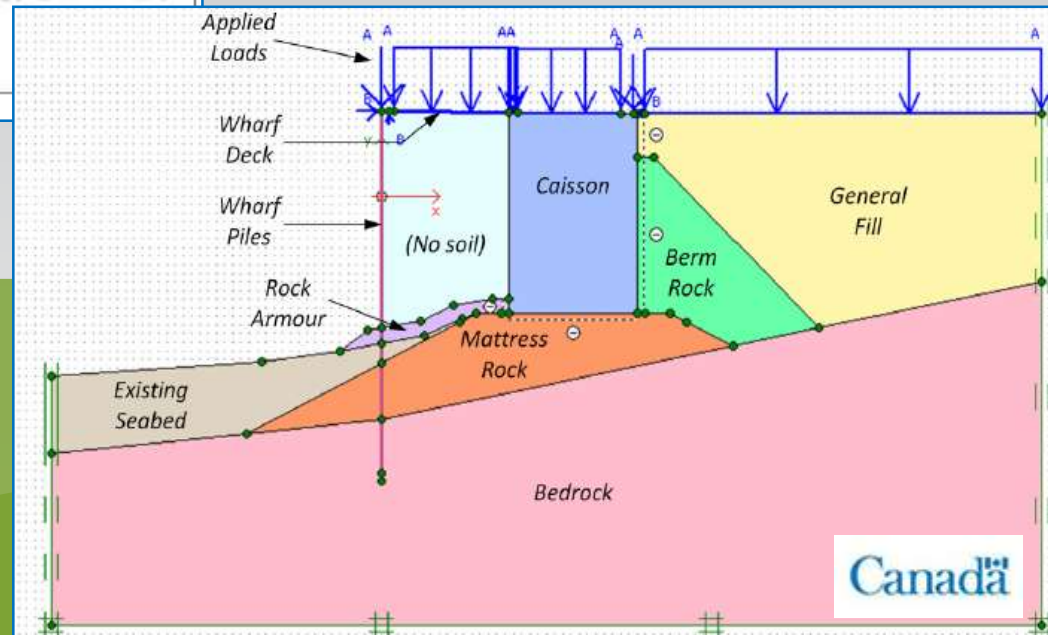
TYPICAL CAISSON WHARF CROSS SECTION
